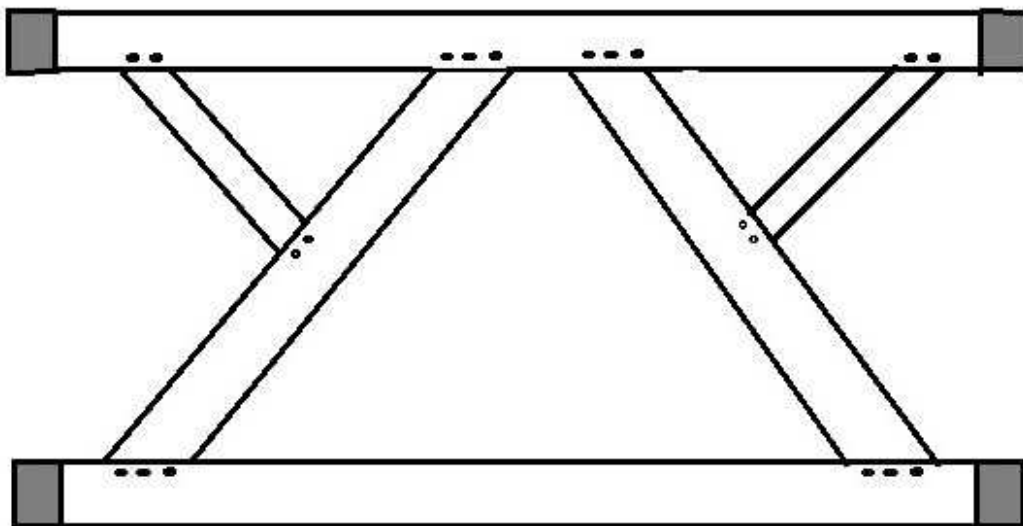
Sketch plan of the arrangement of frames in the tower
